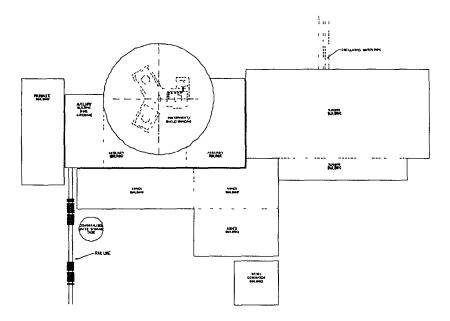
Site plan for a single-unit EP 1000 standard plant
